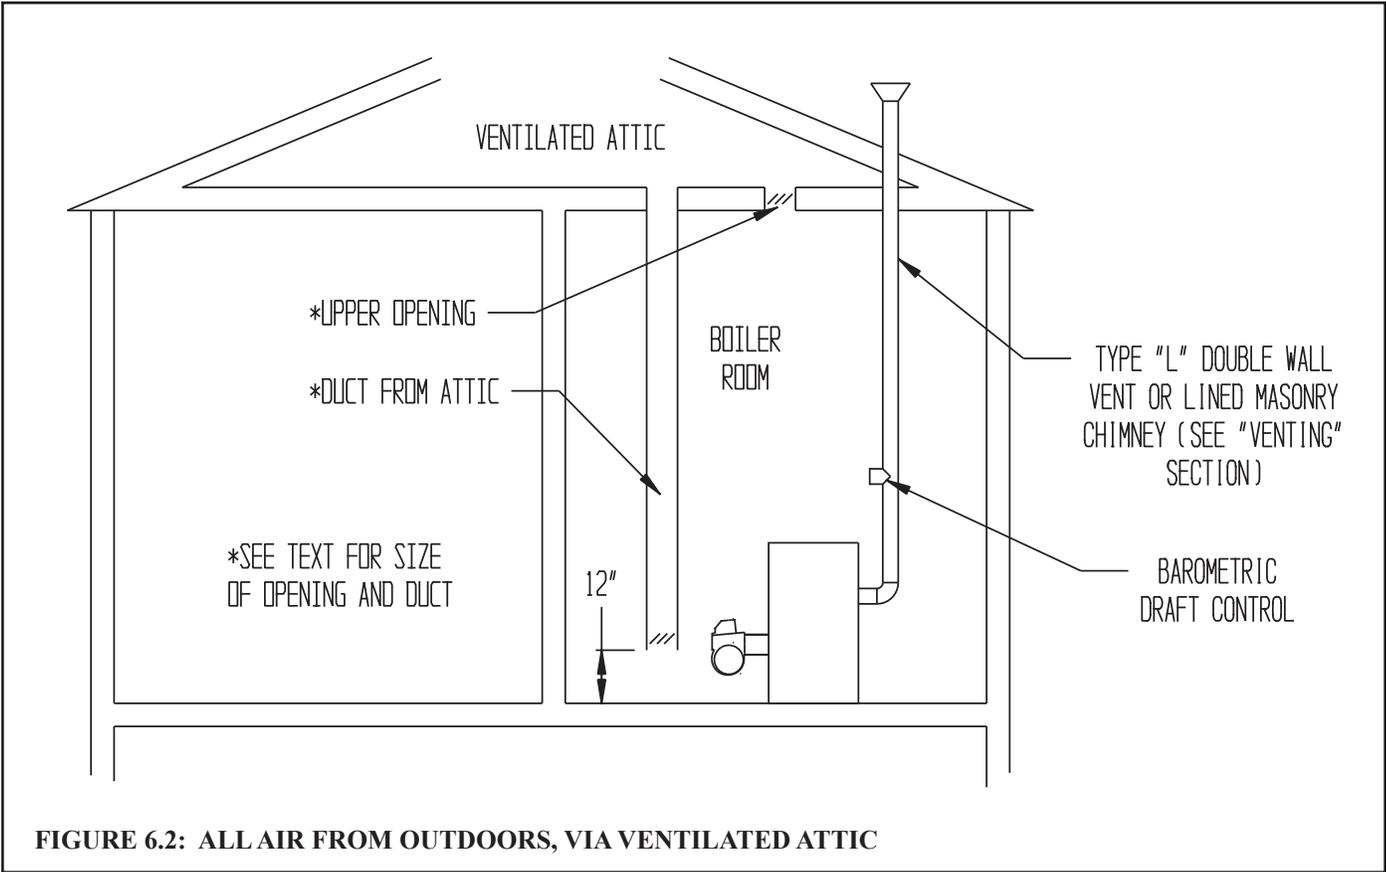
ALL AIR FROM OUTDOORS, VIA VENTILATED ATTIC
